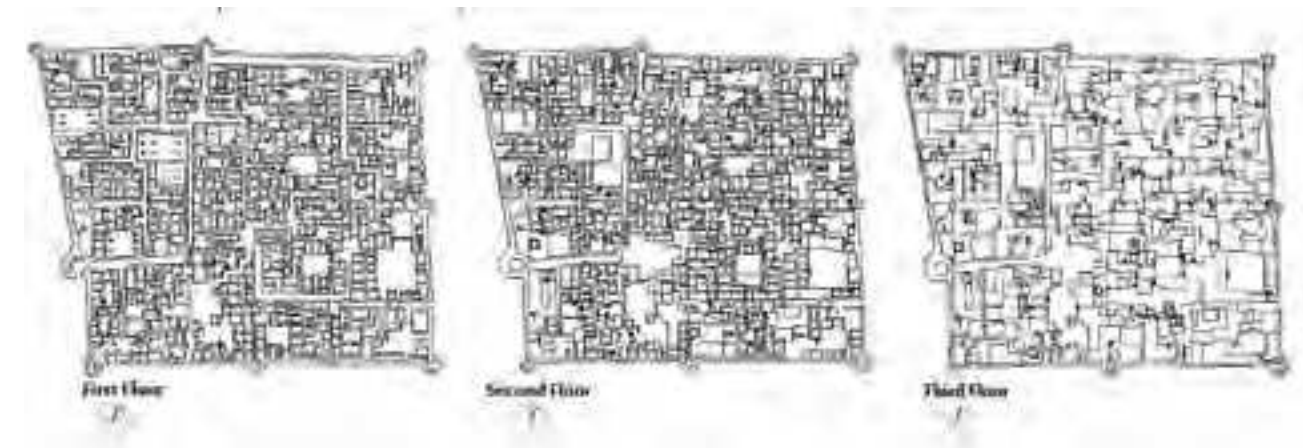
Floor plans of the historic site of Moorcheh Khort (credits: Renovation Company for Moorcheh Khort Historical Fortress, 2008)
